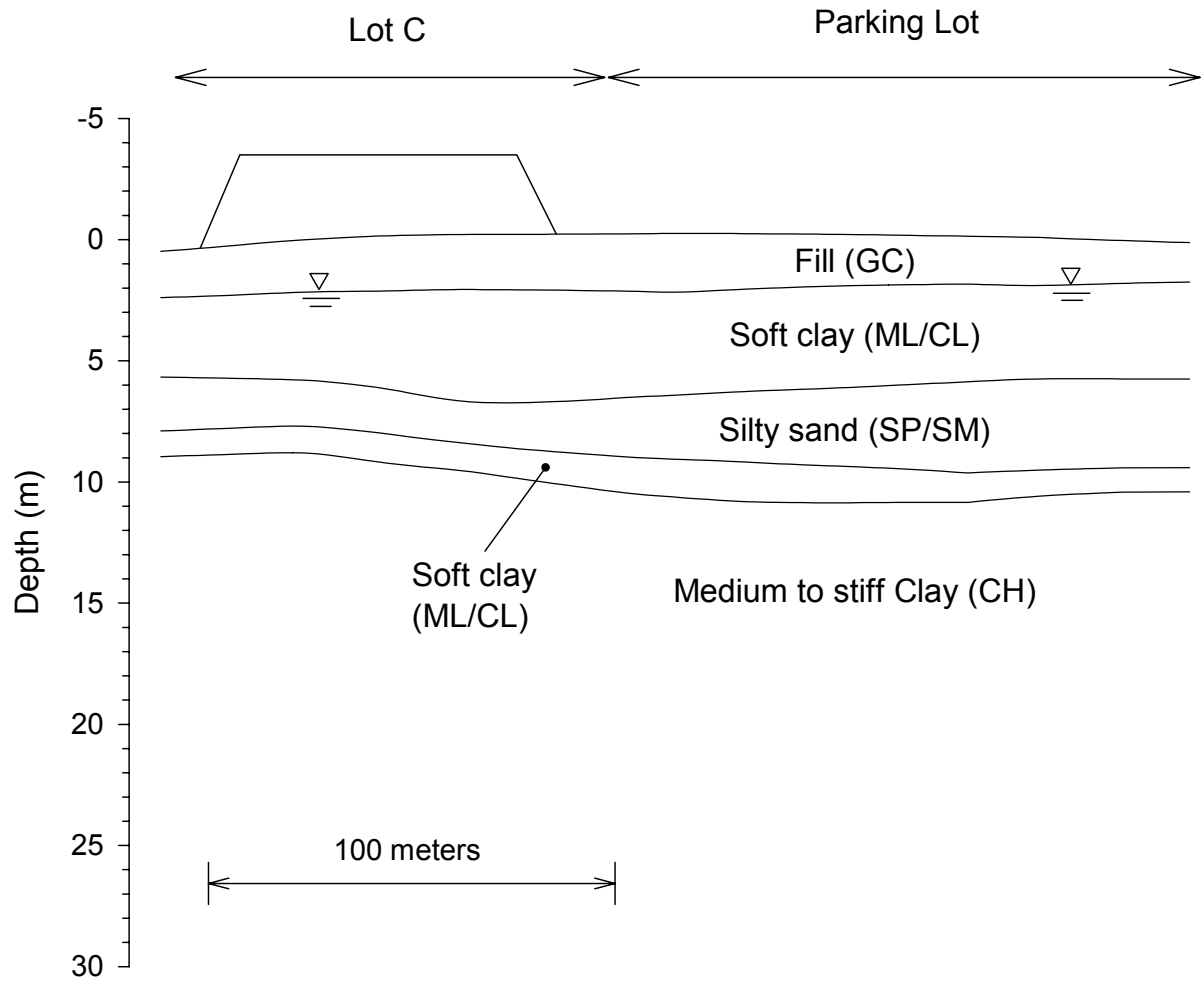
Cross section of soil layering through Lot C and Parking Lot areas (Section B-B in Figure 4-2)
